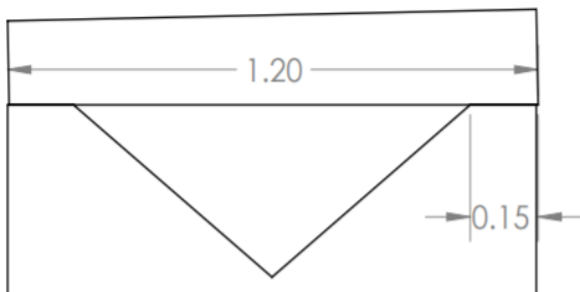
Installation requirements for a sidewalk (Standard Details, 2019)
